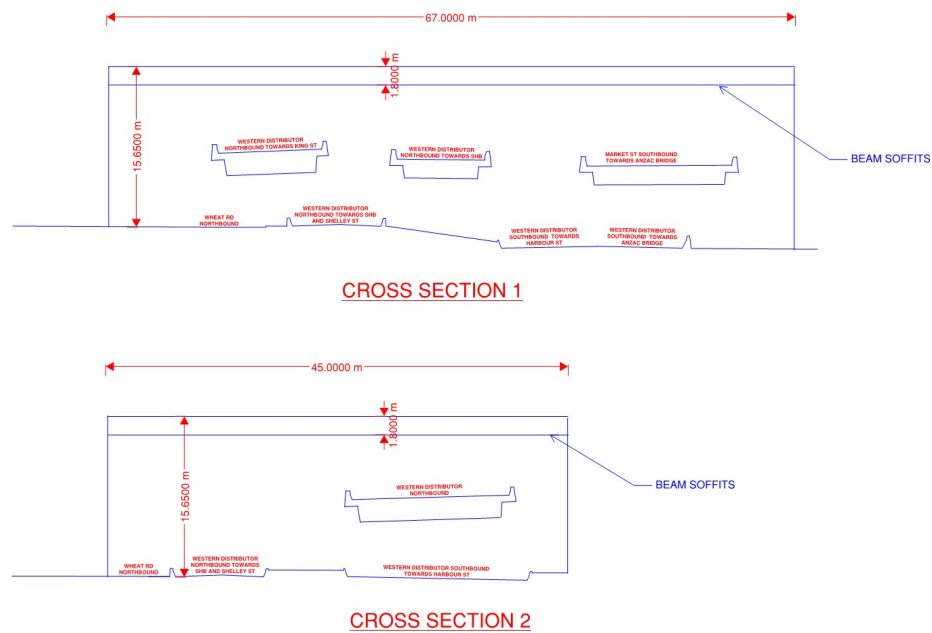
Cross sections of roadways beneath the proposed land bridge (dimensions are approximate only).
